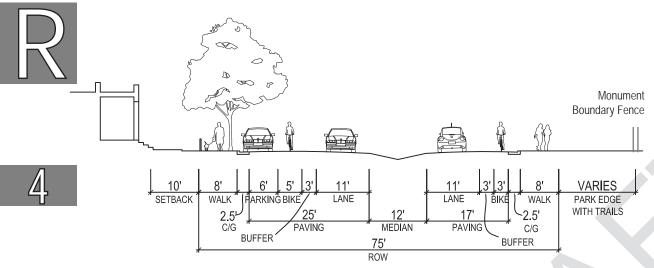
Street Type 4.1: Park Edge Single-Loaded Cross Section
